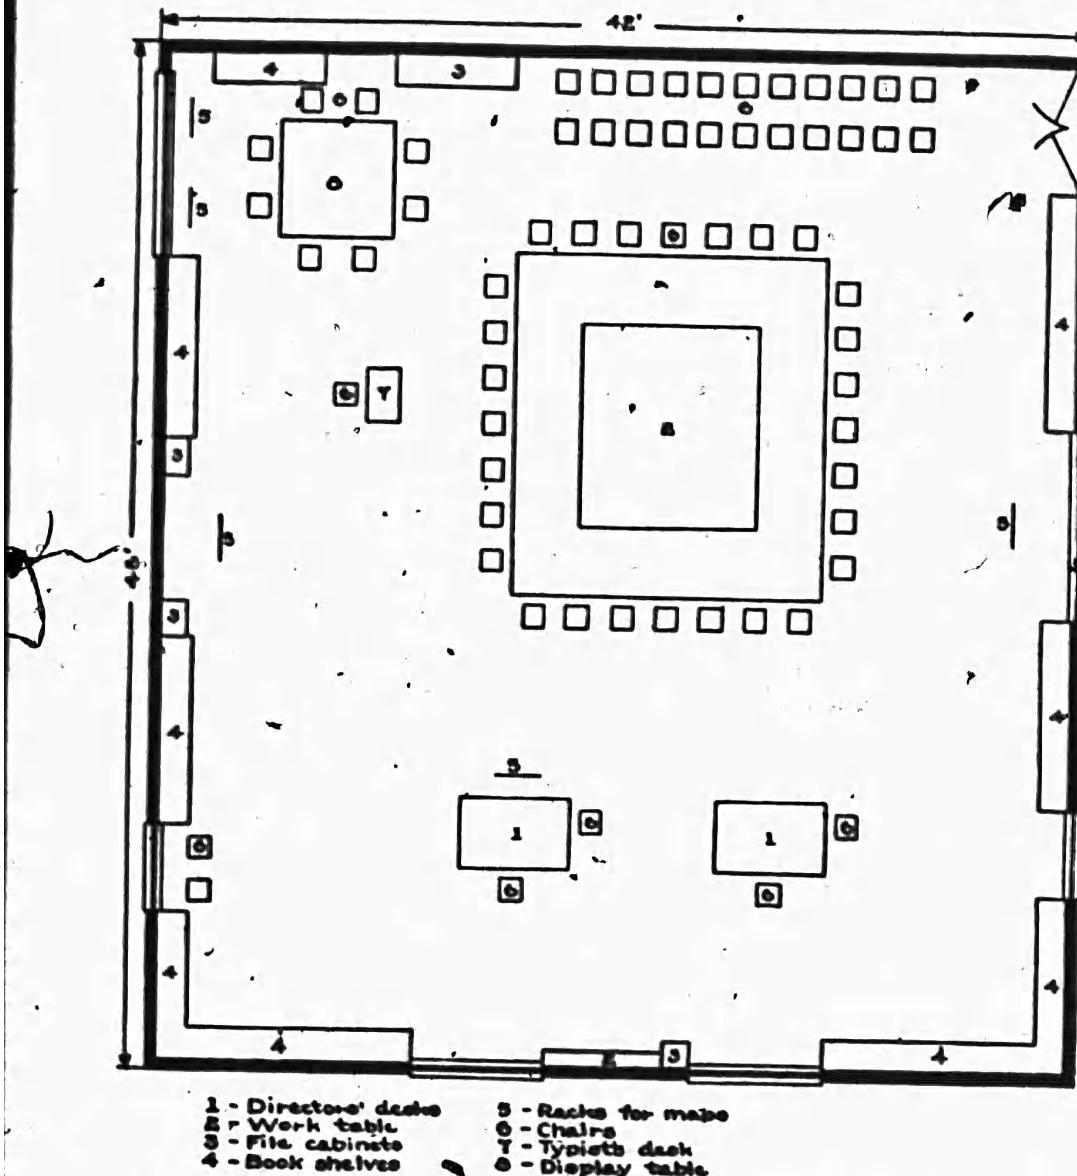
Floor plan of curriculum laboratory, School of Education, Northwestern University.
